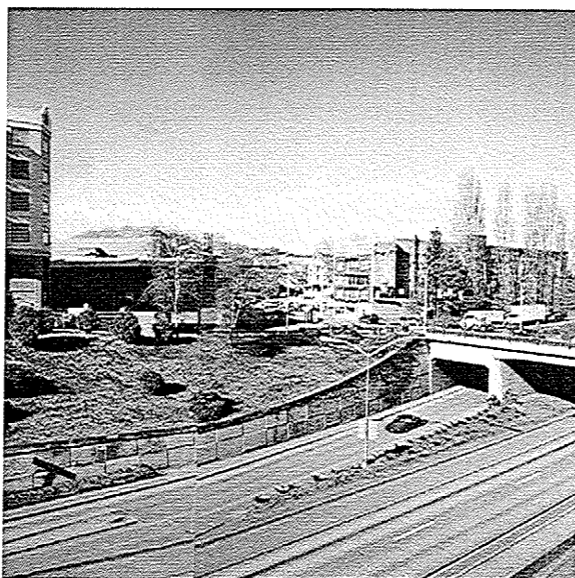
Site photo, looking northwest from Washington and 14th Streets.
